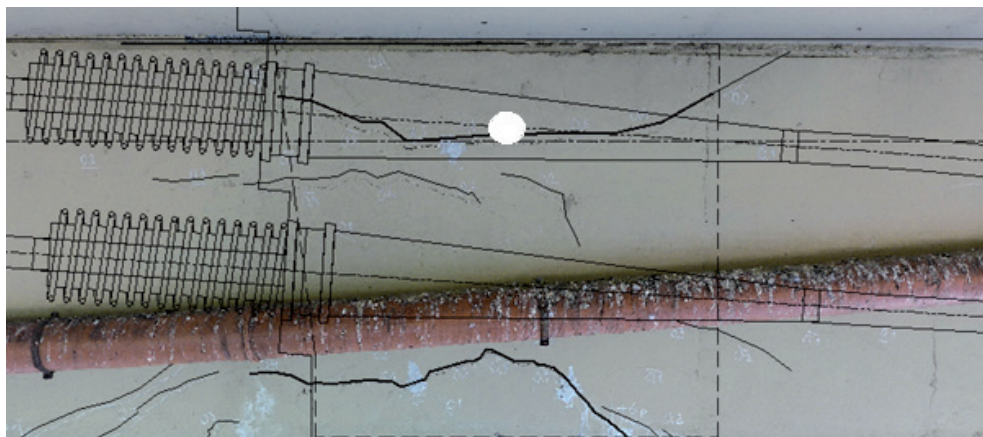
Layout of cracks on the beam surface and the position of the joint between the structure segments and prestressing cable ducts
